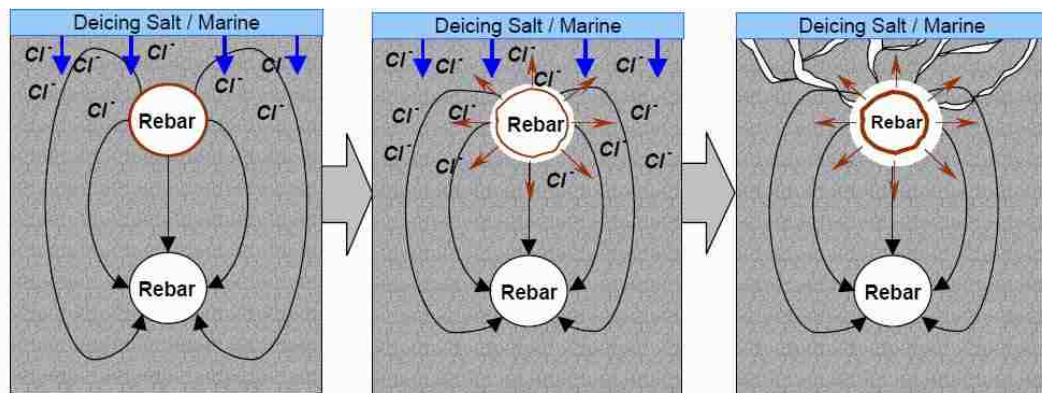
Schematics of rebar corrosion in a concrete block
